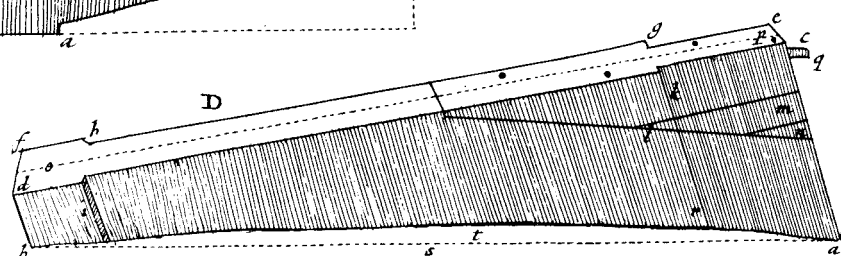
(bottom) Plate XLVIII (drawing D)
